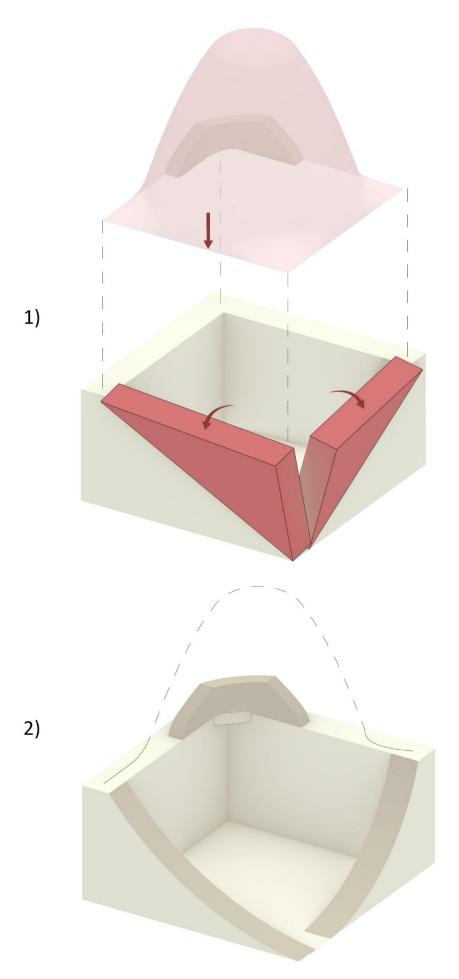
Models of collapse mechanism of completely collapsed dome :
